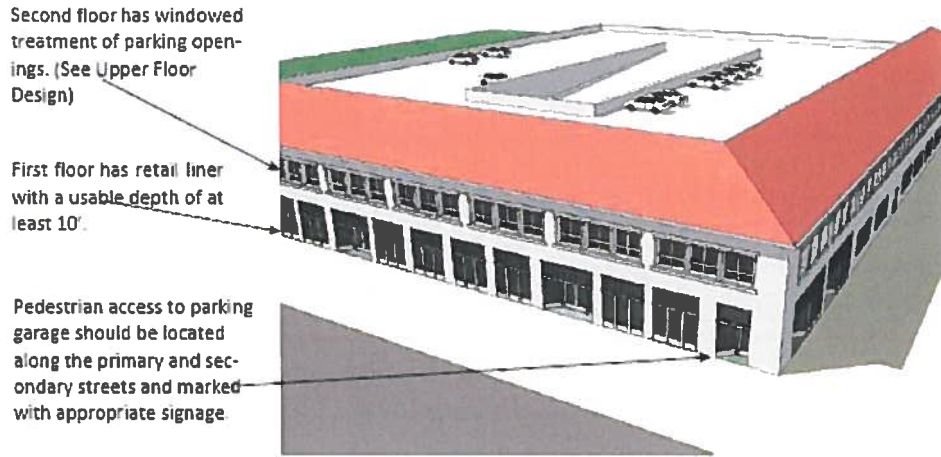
G: Building Design, Building in Front of Parking Garage
